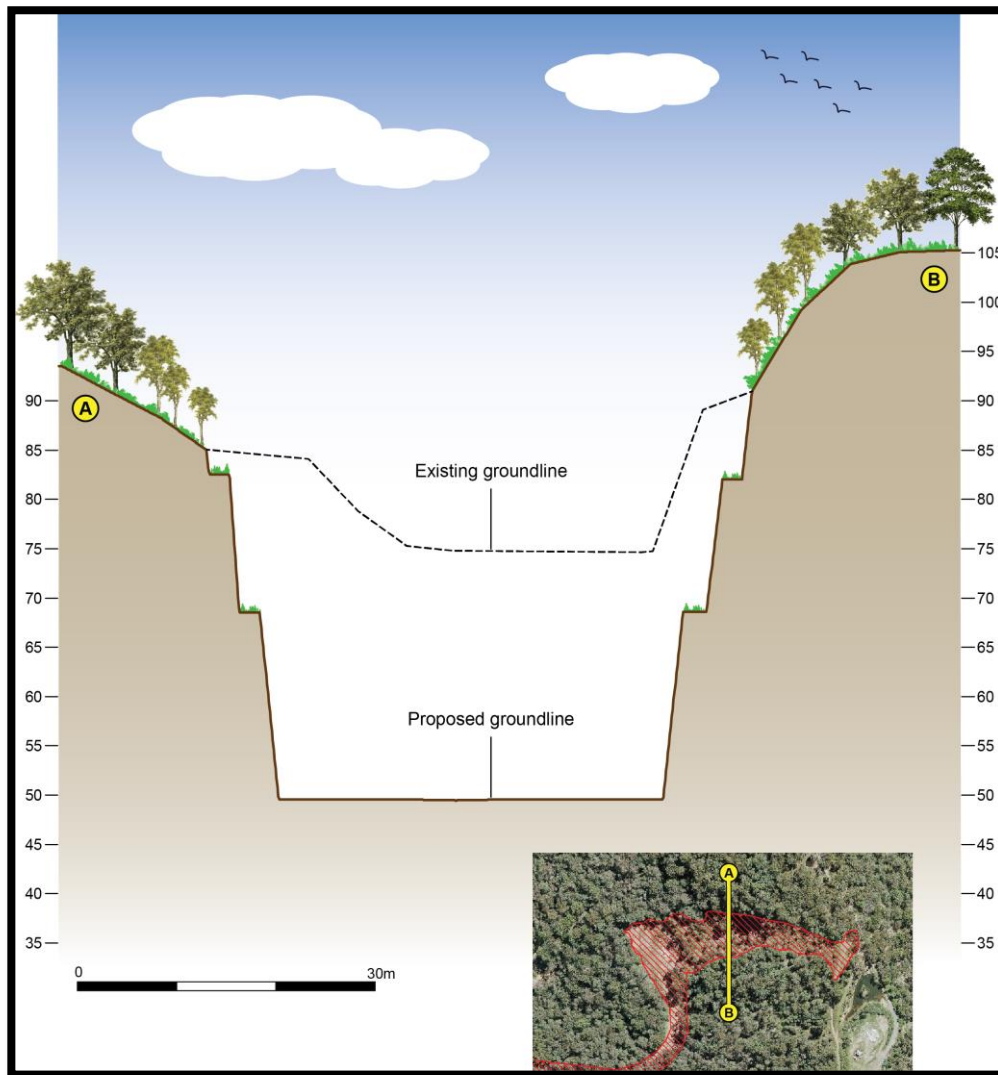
Indicative cross section of Tyndale Borrow Site
